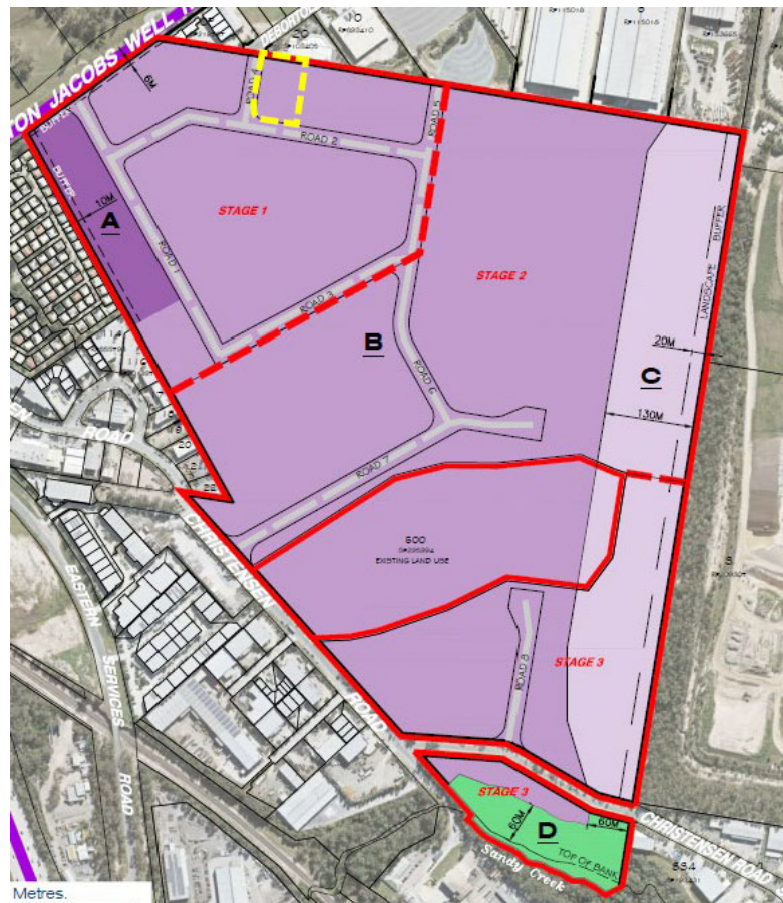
Subject site and future development site location (Source: Plan of subdivision)
